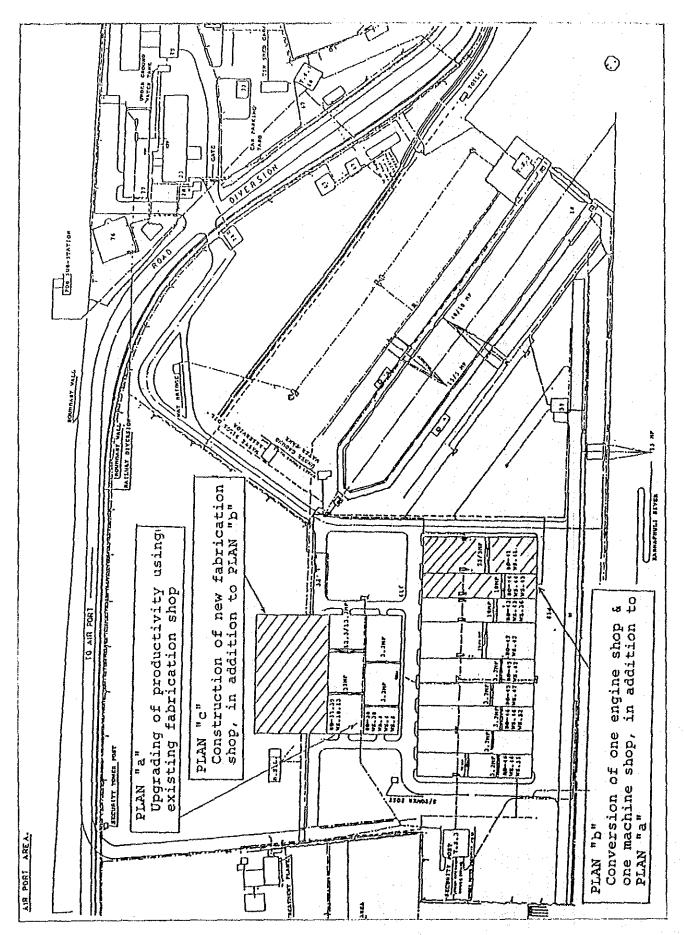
Proposed Idea Plan on Steel Structure Fabrication Shop
